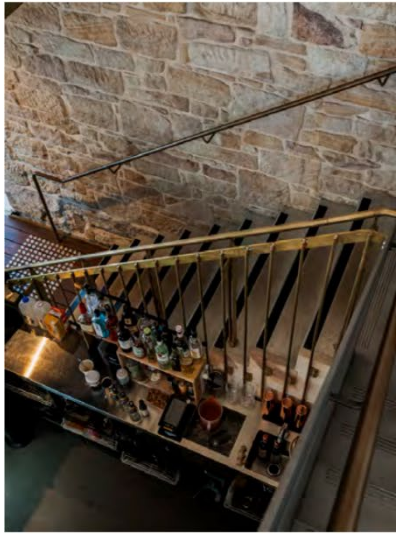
View of the contemporary stair internal stair between the ground and first floor and bar to the ground floor.
